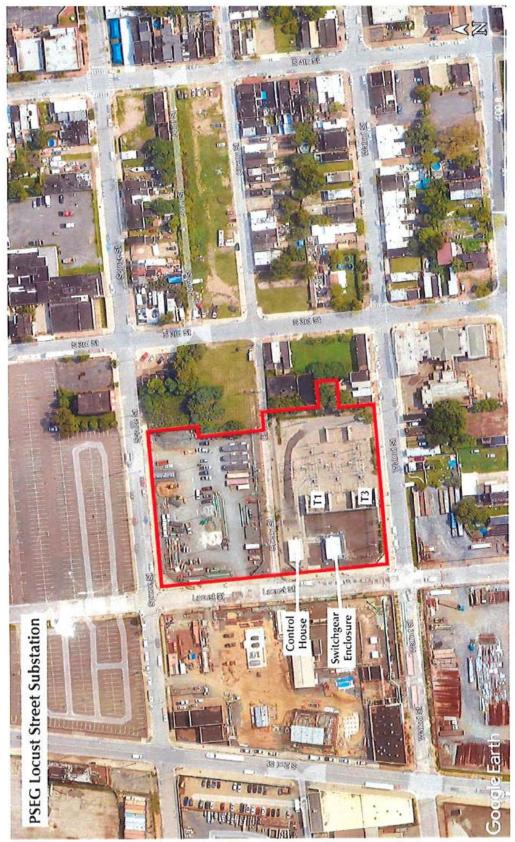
Aerial image showing existing conditions and major equipment at PSE&G Locust Street Substation, Camden, NJ. The site property line is outlined in red.
